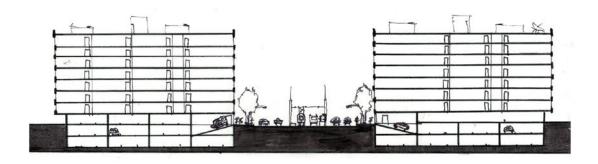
Sectional Analysis of Underground Parking Structures on K Street N.W.,
